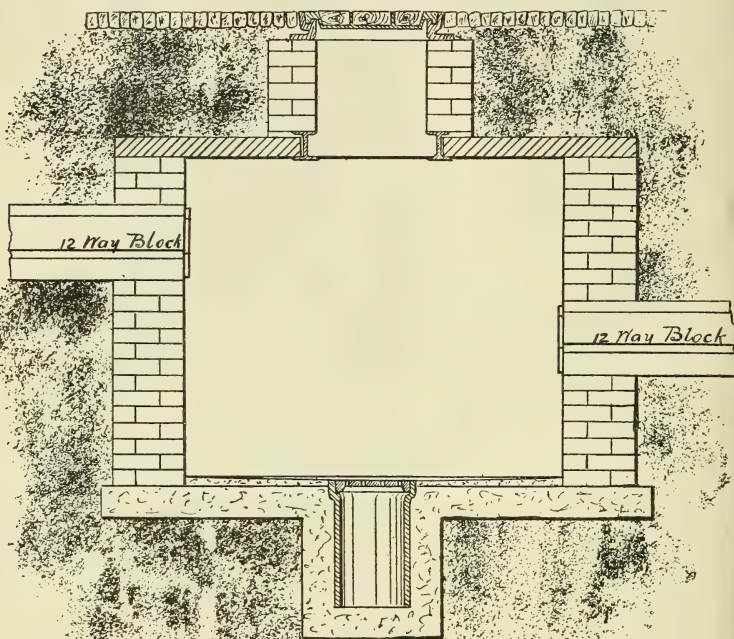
Manhole under Roadway (Scale $\frac{1}{8}$)
